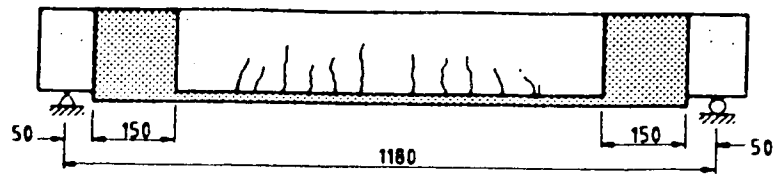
Fibreglass jackets used to improve anchorage of plates bonded to tensile flange of concrete beams (Sharif *et al*, 1994)
